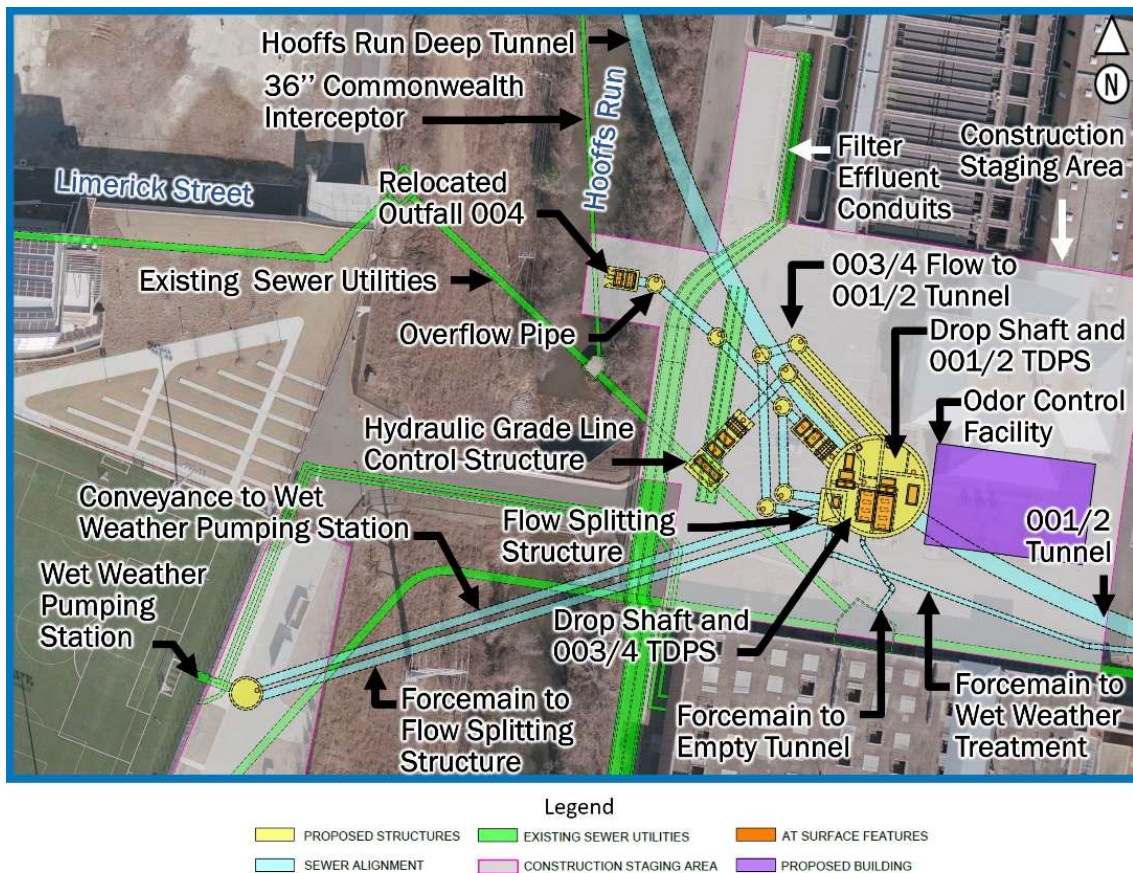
Hooffs Run Deep Tunnel Structures at the WRRF
